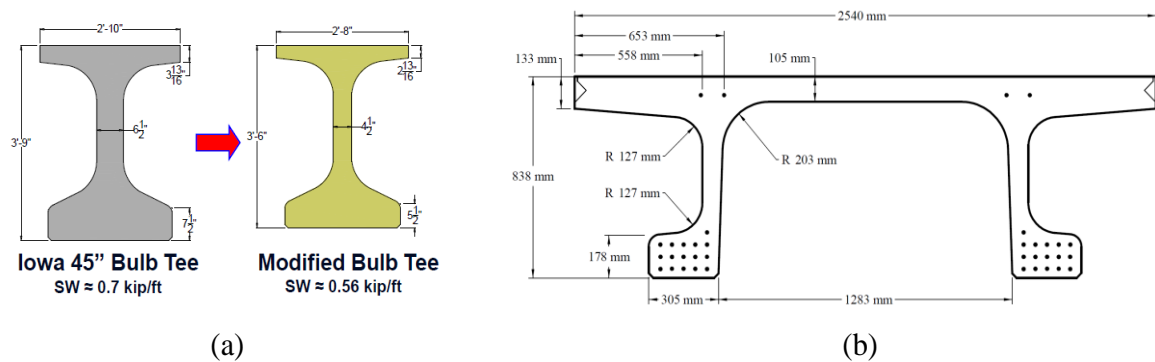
(a) Mars Hill Bridge girder comparison [65] and (b) Pi girder used in Jakway Park Bridge [6]
